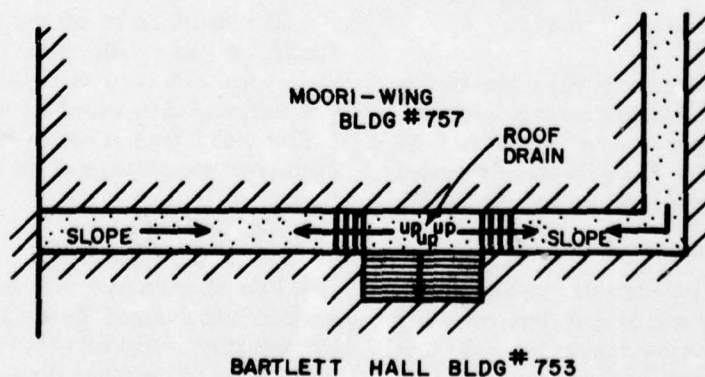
Roof of Building No. 753, U.S. Military Academy.
